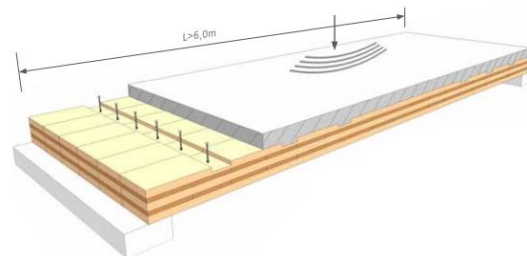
KLH timber-concrete composite floor (*Timber Concrete Composites, 2019*)
